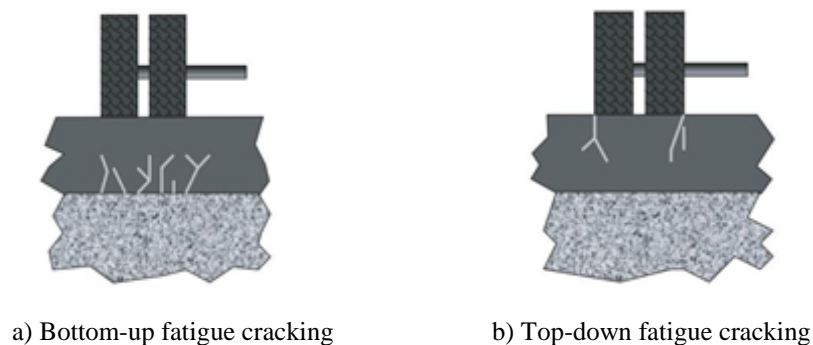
Types of fatigue cracking in asphalt pavement [20]
